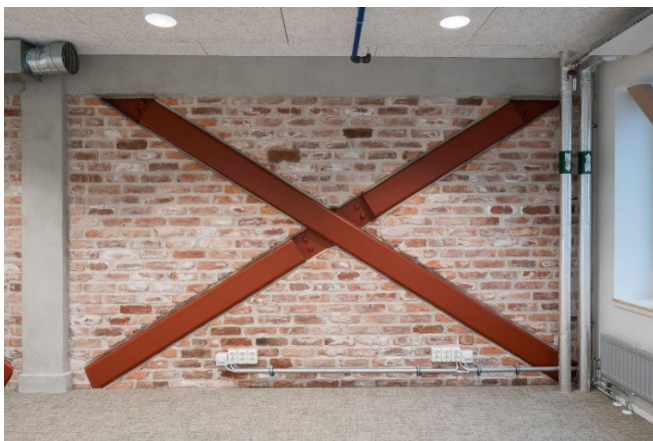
Reused steel structure and reused bricks were used for the exterior walls in the project KA13 in Oslo.⁴⁸
